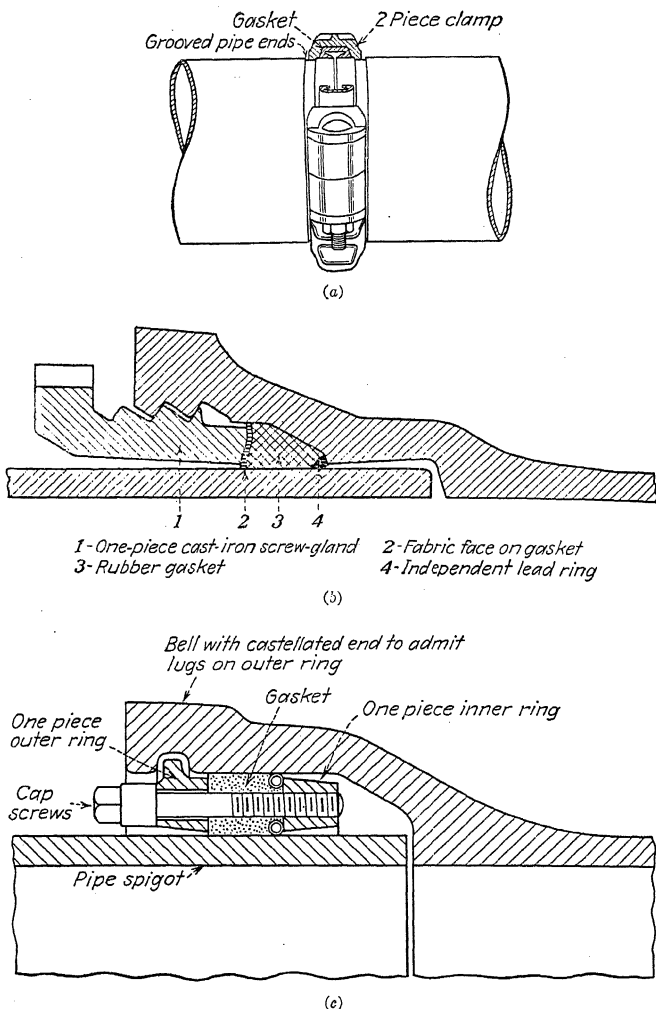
Miscellaneous pipe joints: (a) Victaulic coupling; (b) screw-gland joint; (c) Bellmaster joint.
